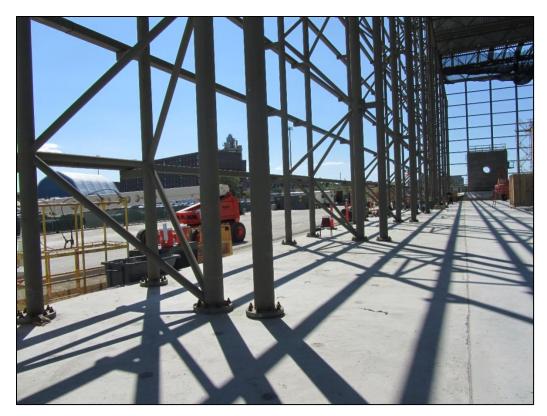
WTTC wall trusses and test stand (20 August 2010)
